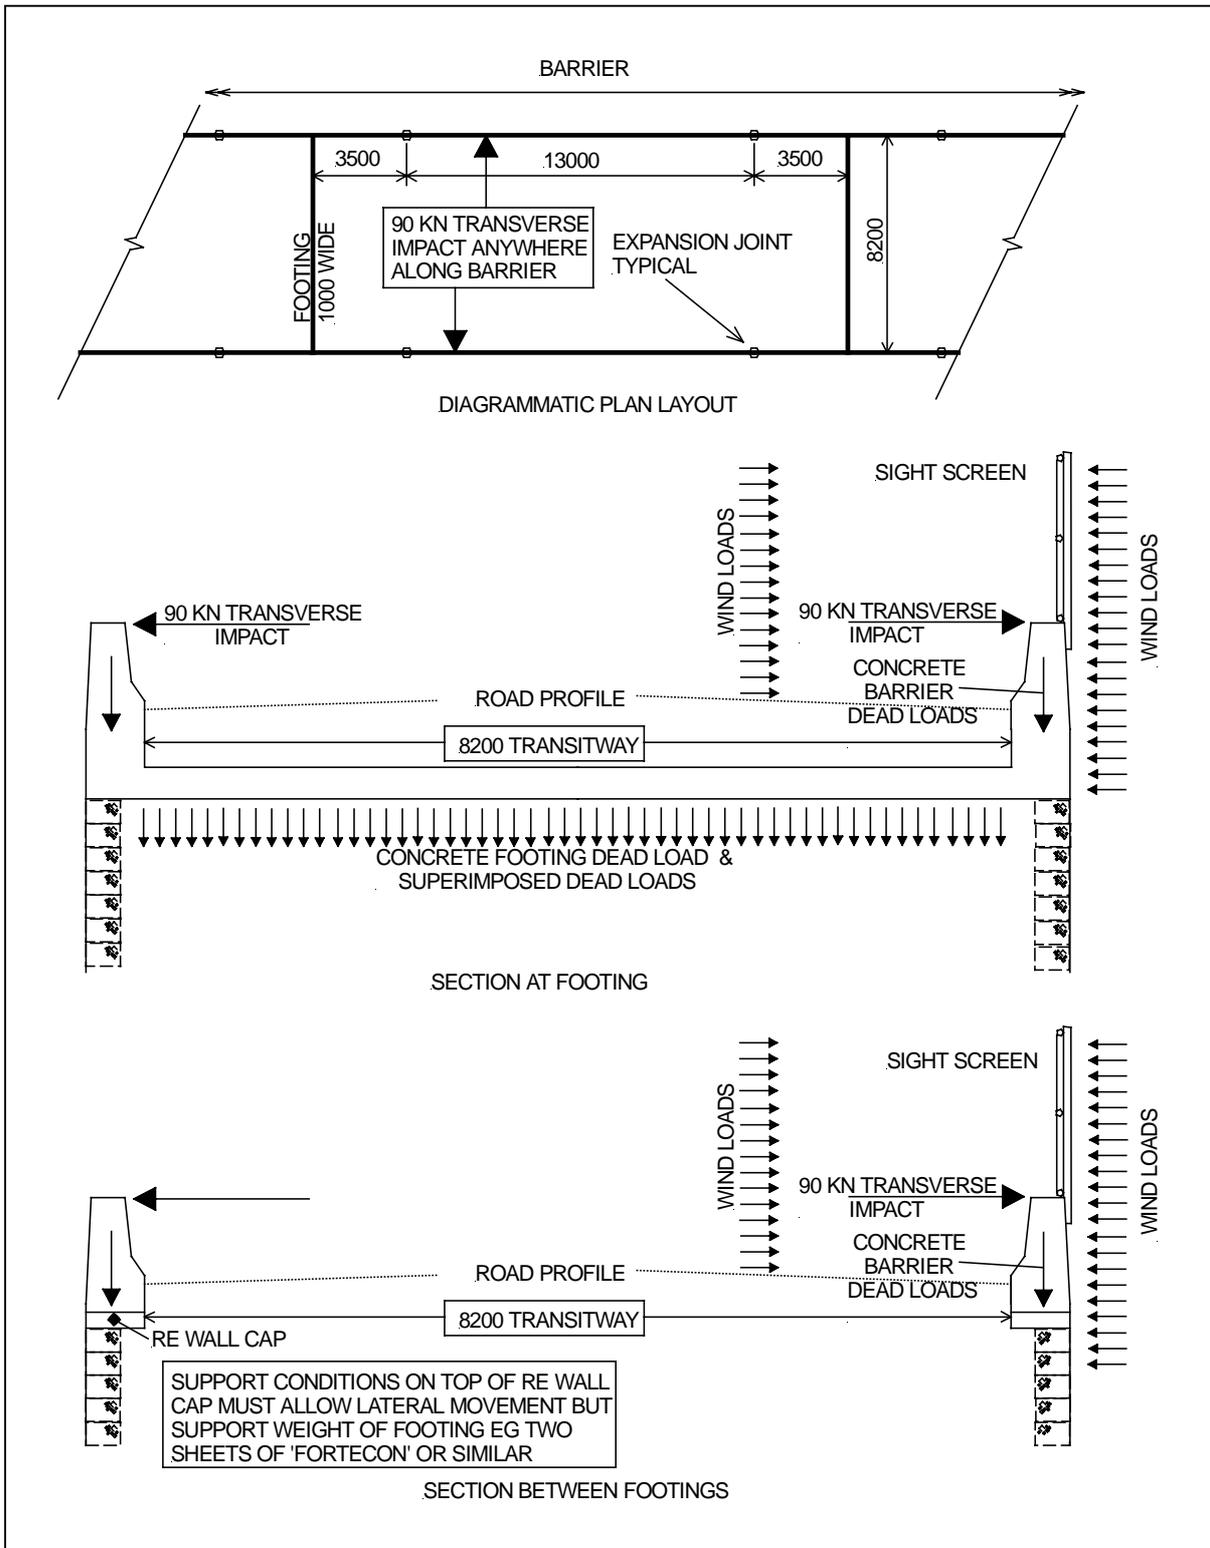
Application of Loads to Integrated Barrier and Footing Structure
